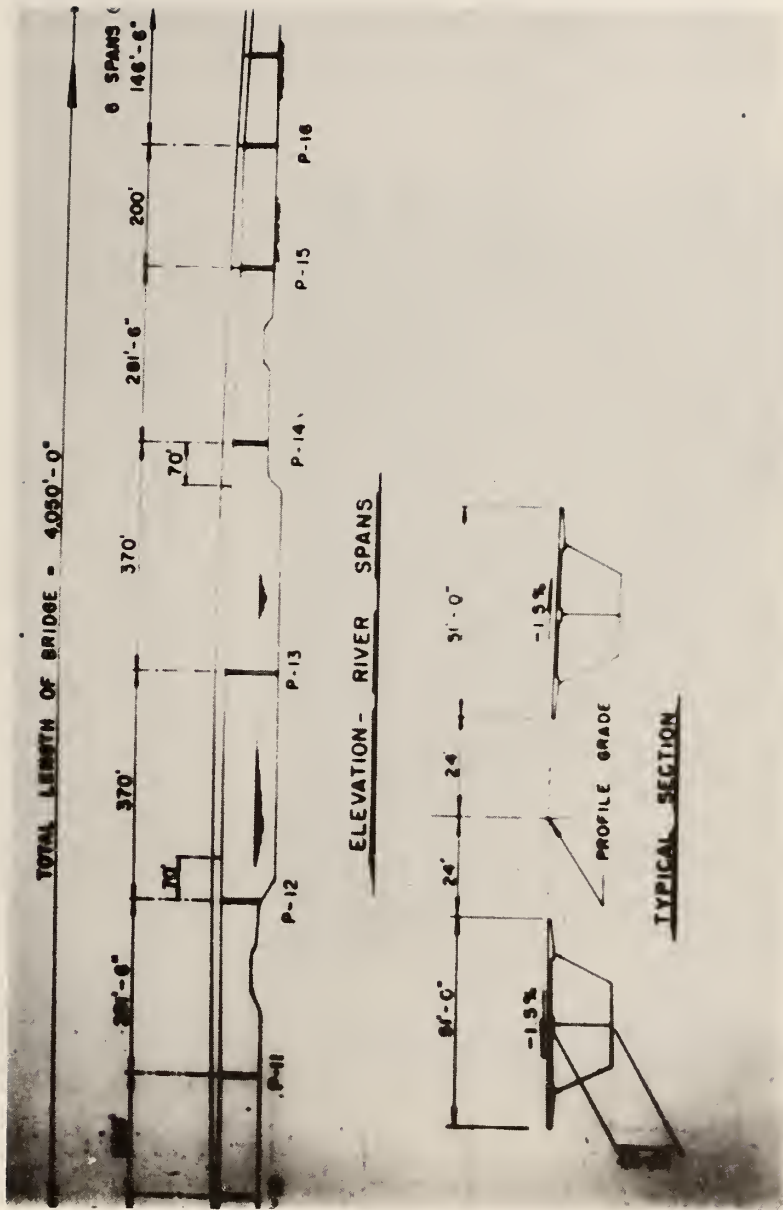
Section and elevation of 4050 ft. (1234 m) long structure.
